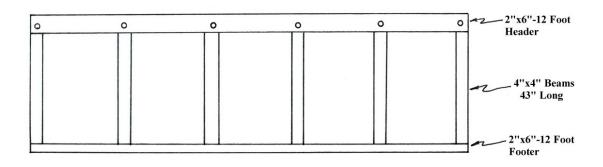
Drill Location on 12 Foot Long 2" x 6" Lumber
